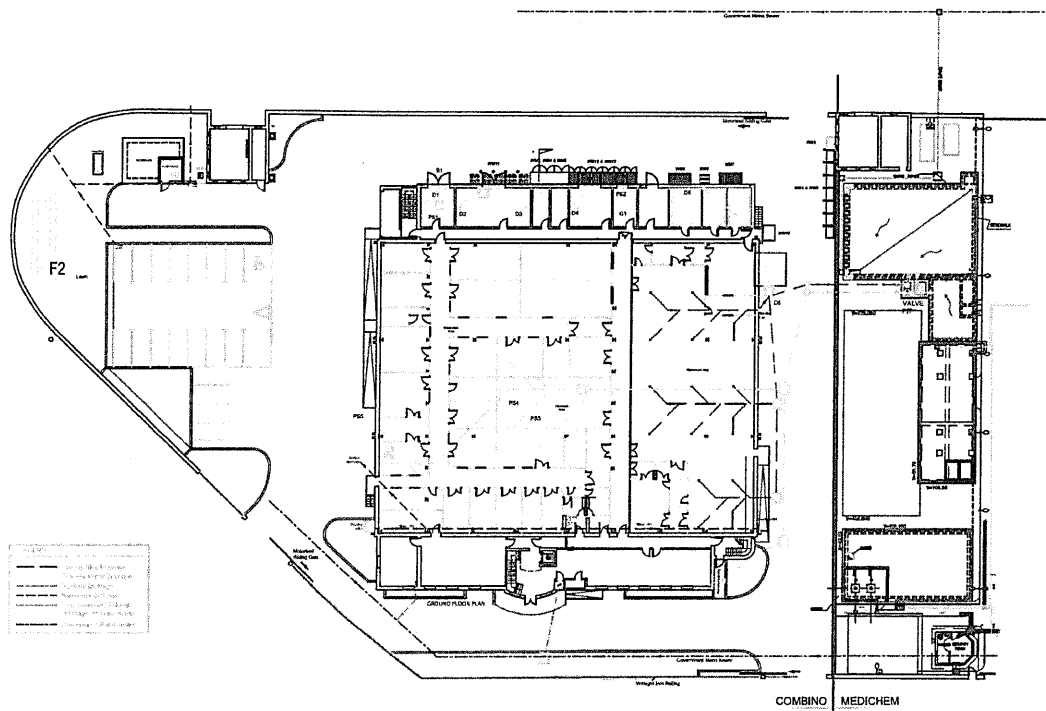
Site of installation, showing extent of area authorised for activity (outlined in bold blue).
